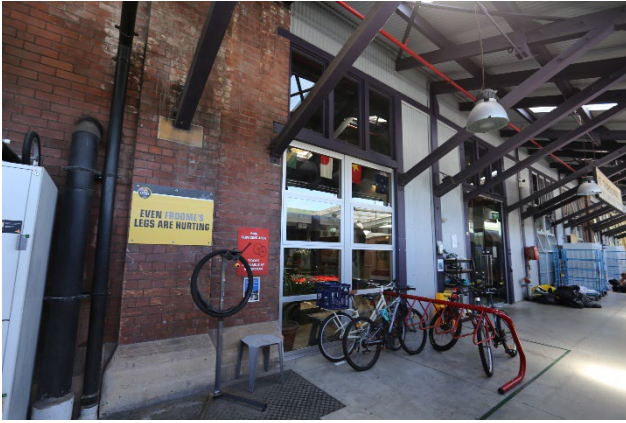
East elevation of the shed, with the timber expressed frame and masonry and sandstone piers.
